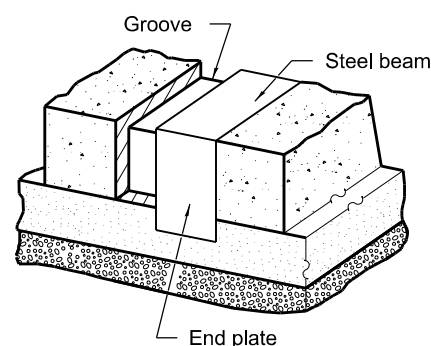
### DETAIL OF CUTTING AND WELDING BEAM
